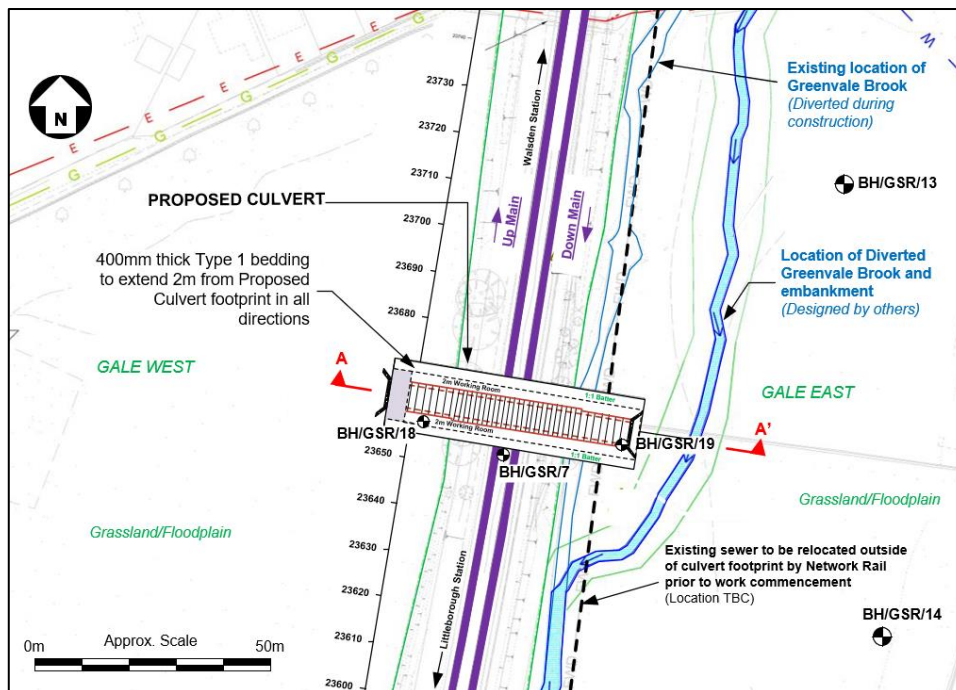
Site plan showing location of the box culvert in relation to the Network Rail Calder Valley Railway Line and Greenvale Brook.
